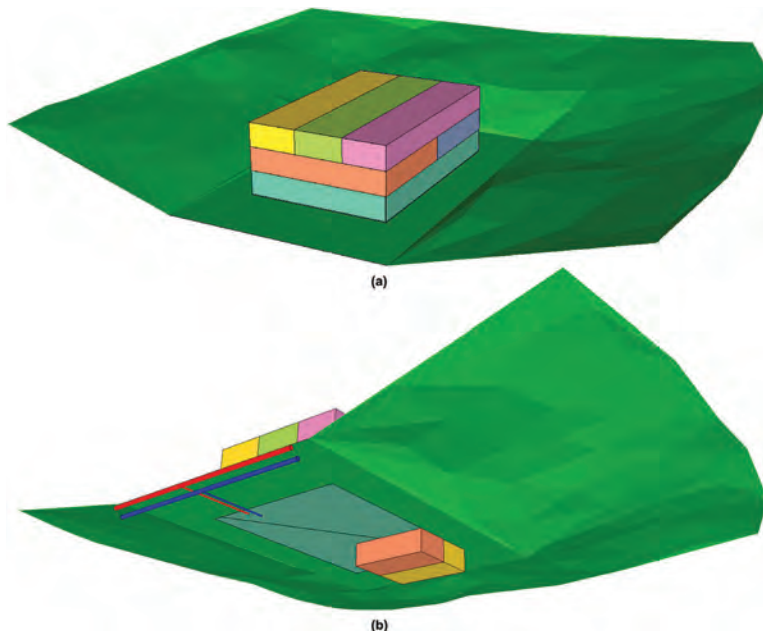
The terrain model and the building units. a) Six building units. b) Two underground units —basements and utilities.
